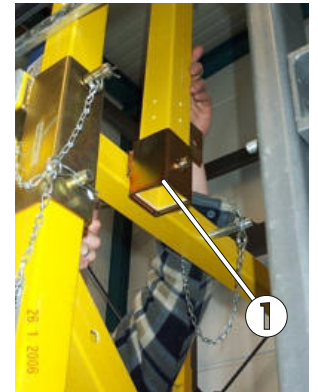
Positioning the fastening bolt with upper rail stanchion
